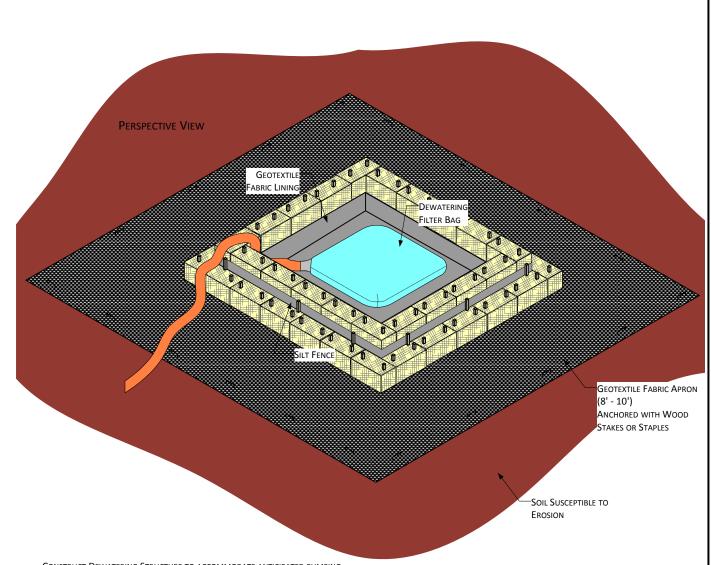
A Environmental Protection Plan Straw Bale Dewatering Structure
